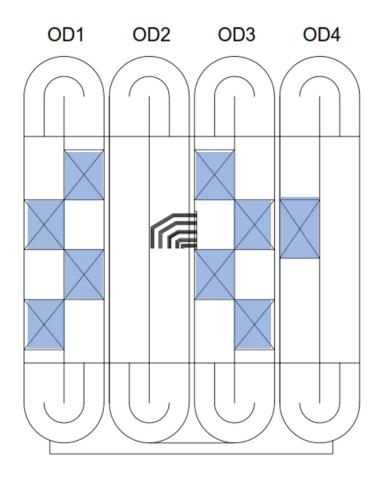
Picture taken from construction plan. Diffuser placement shown with blue boxes
